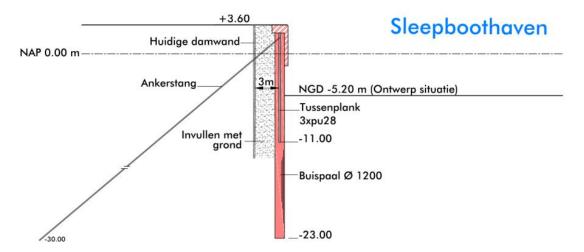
Cross-section of the new quay wall structure in the Sleepboothaven
